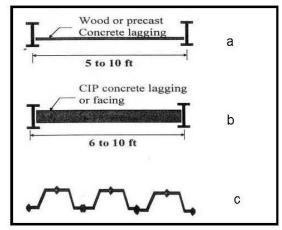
, In-Situ Structural Walls (Modified from Earth Retaining Structures – June 2008)
